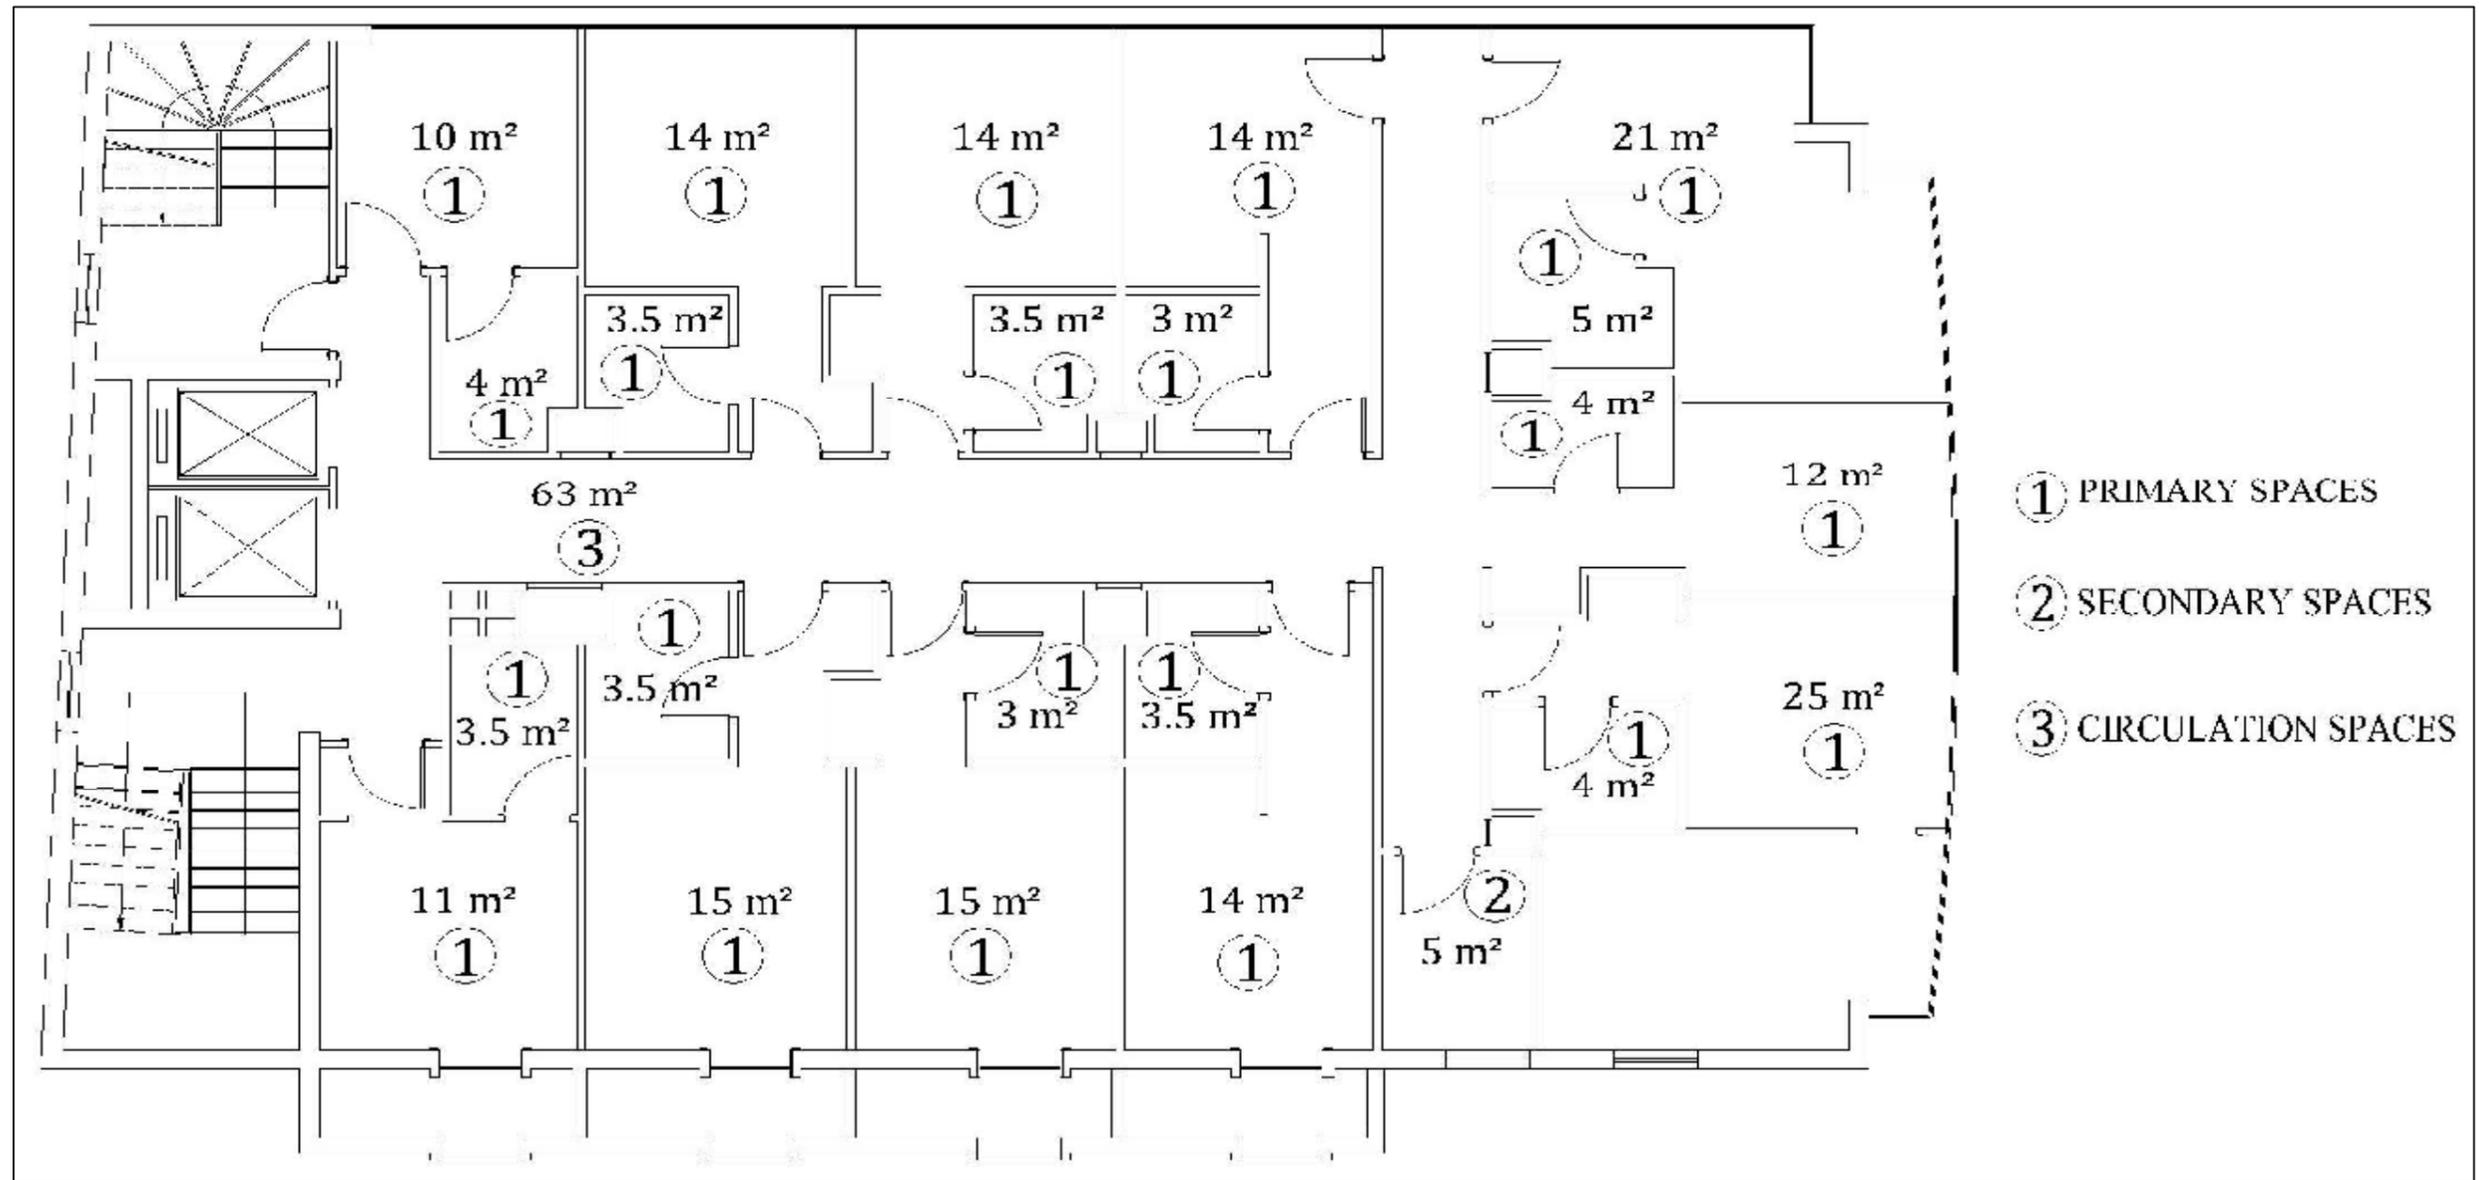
Floor plan of Sample 02 (S02) displaying, primary, secondary and circulation spaces.
